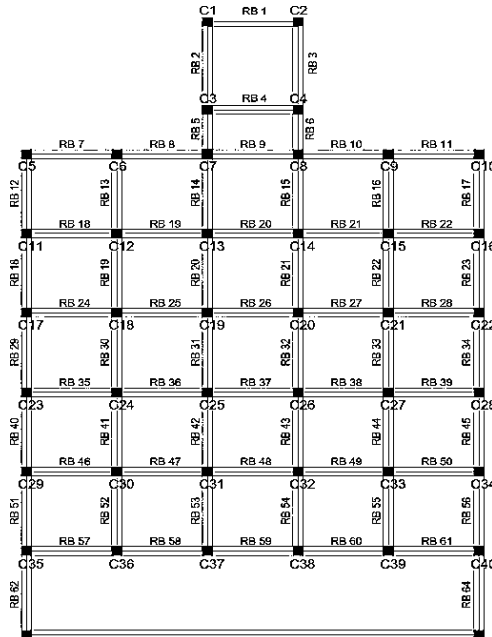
The column and roof beams position for UPV test at Masjid An Nur
